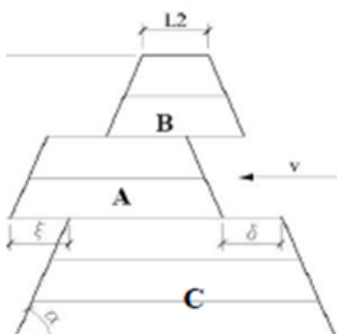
Simplified cross section of the embankment geometry after rock impact (Ronco et al., 2009)
